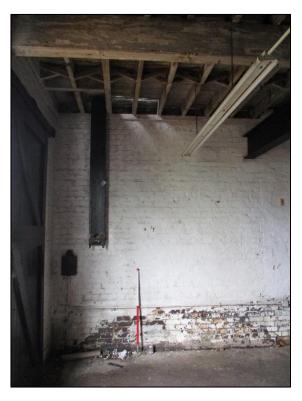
Shoot from first-floor level and additional bracing of the first-floor floor boards
